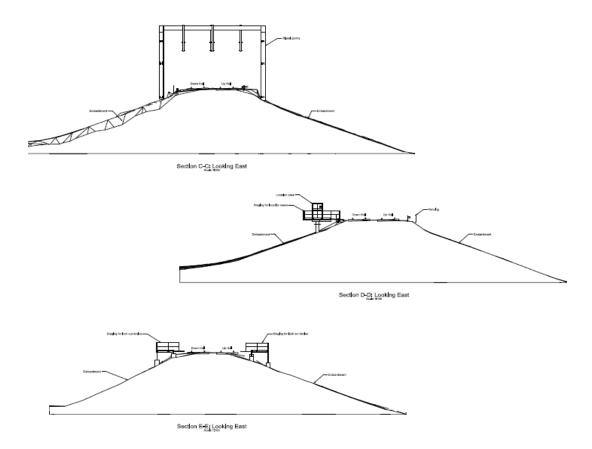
Elevations of the Kirkgate to Marsh Lane Land Equipment
